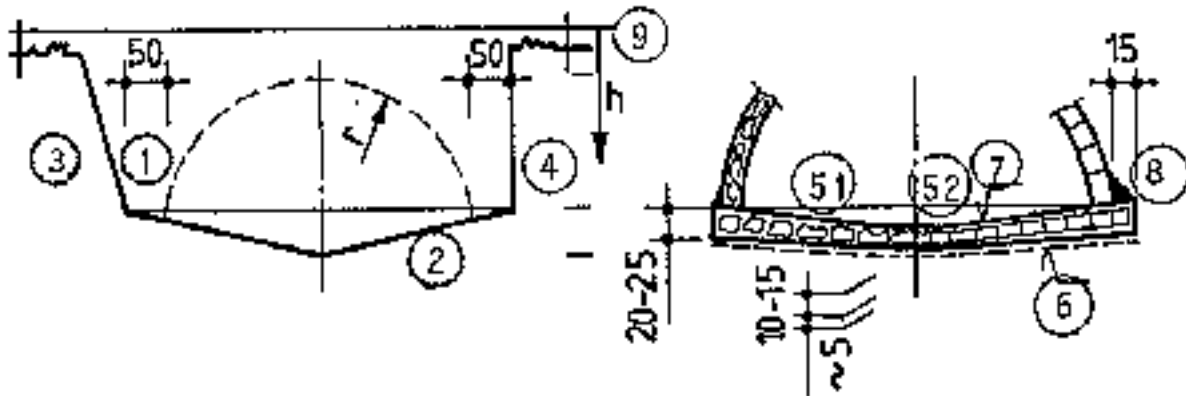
Level line, excavation and foundation. 1 Workspace, 2 Inclination of conical foundation, 3 Sloping excavation, 4 Vertical excavation, 51 Quarrystone foundation, 52 Brick foundation, 6 Packing sand, 7 Mortar screed, 8 Foot reinforcement for fixed-dome plant, 9 Level line (Source: OEKOTOP / Sasse 1984)
